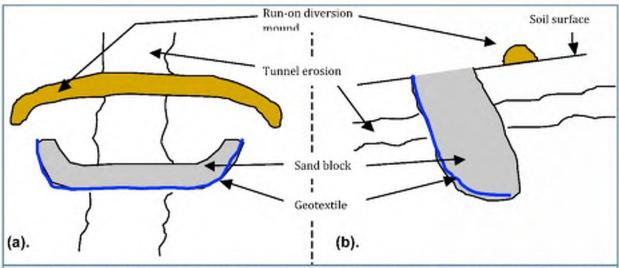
Modified sand block design. (a) plan view, (b) cross section view. The depth of the sand block is determined by the depth of dispersive soils or tunnel erosion. The span length of the structure is determined by the width of the tunnelling.
